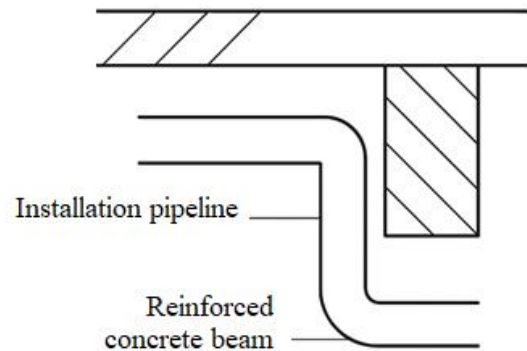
Intersection of an installation pipeline with a reinforced concrete beam
